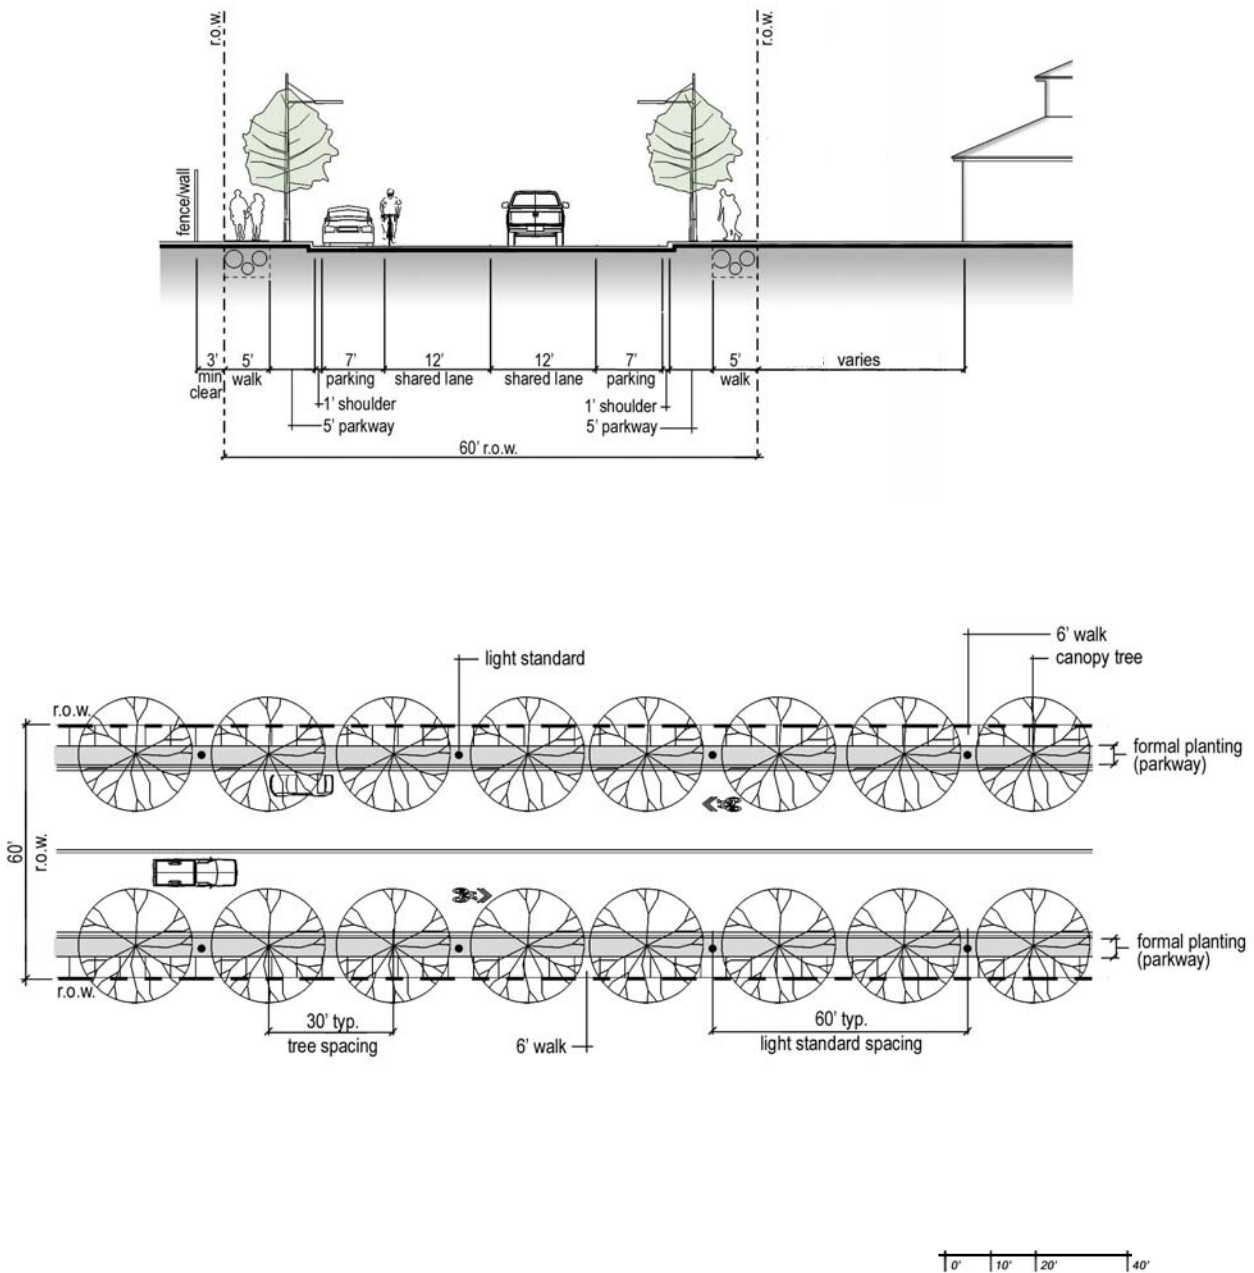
Typical Collector Section & Plan: Minor Collector
